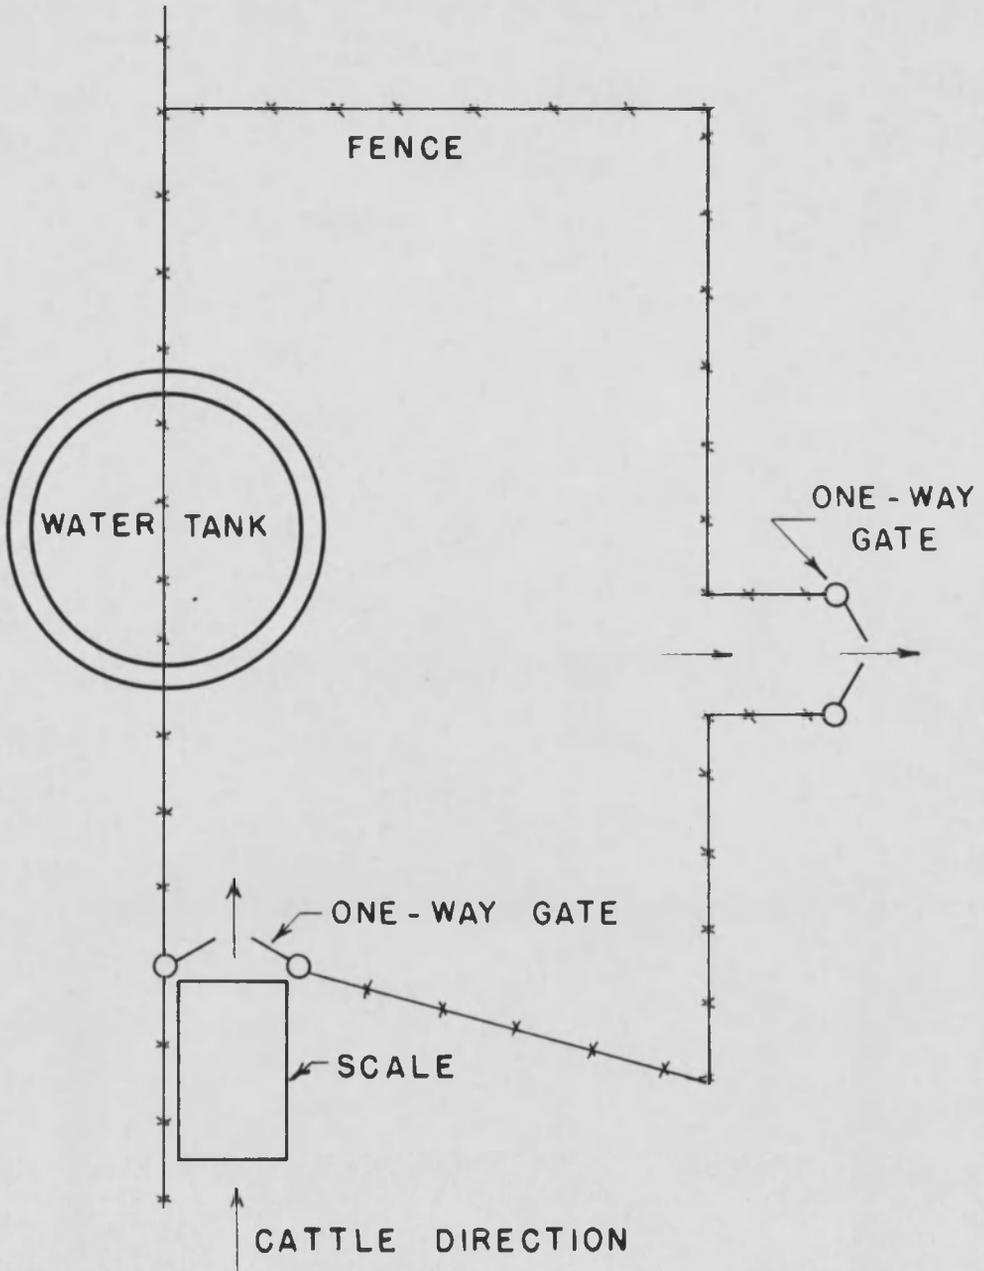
Plan view of scale site at Santa Rita Experimental Range.
